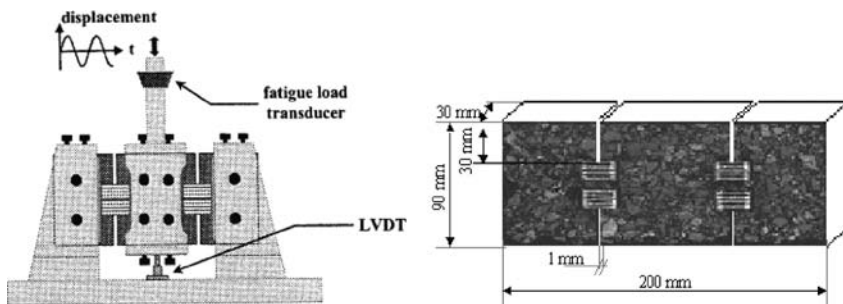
Schematic view of the modified shearing test and the specimen geometry.
